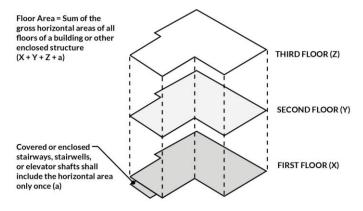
E: DETERMINING FLOOR AREA
